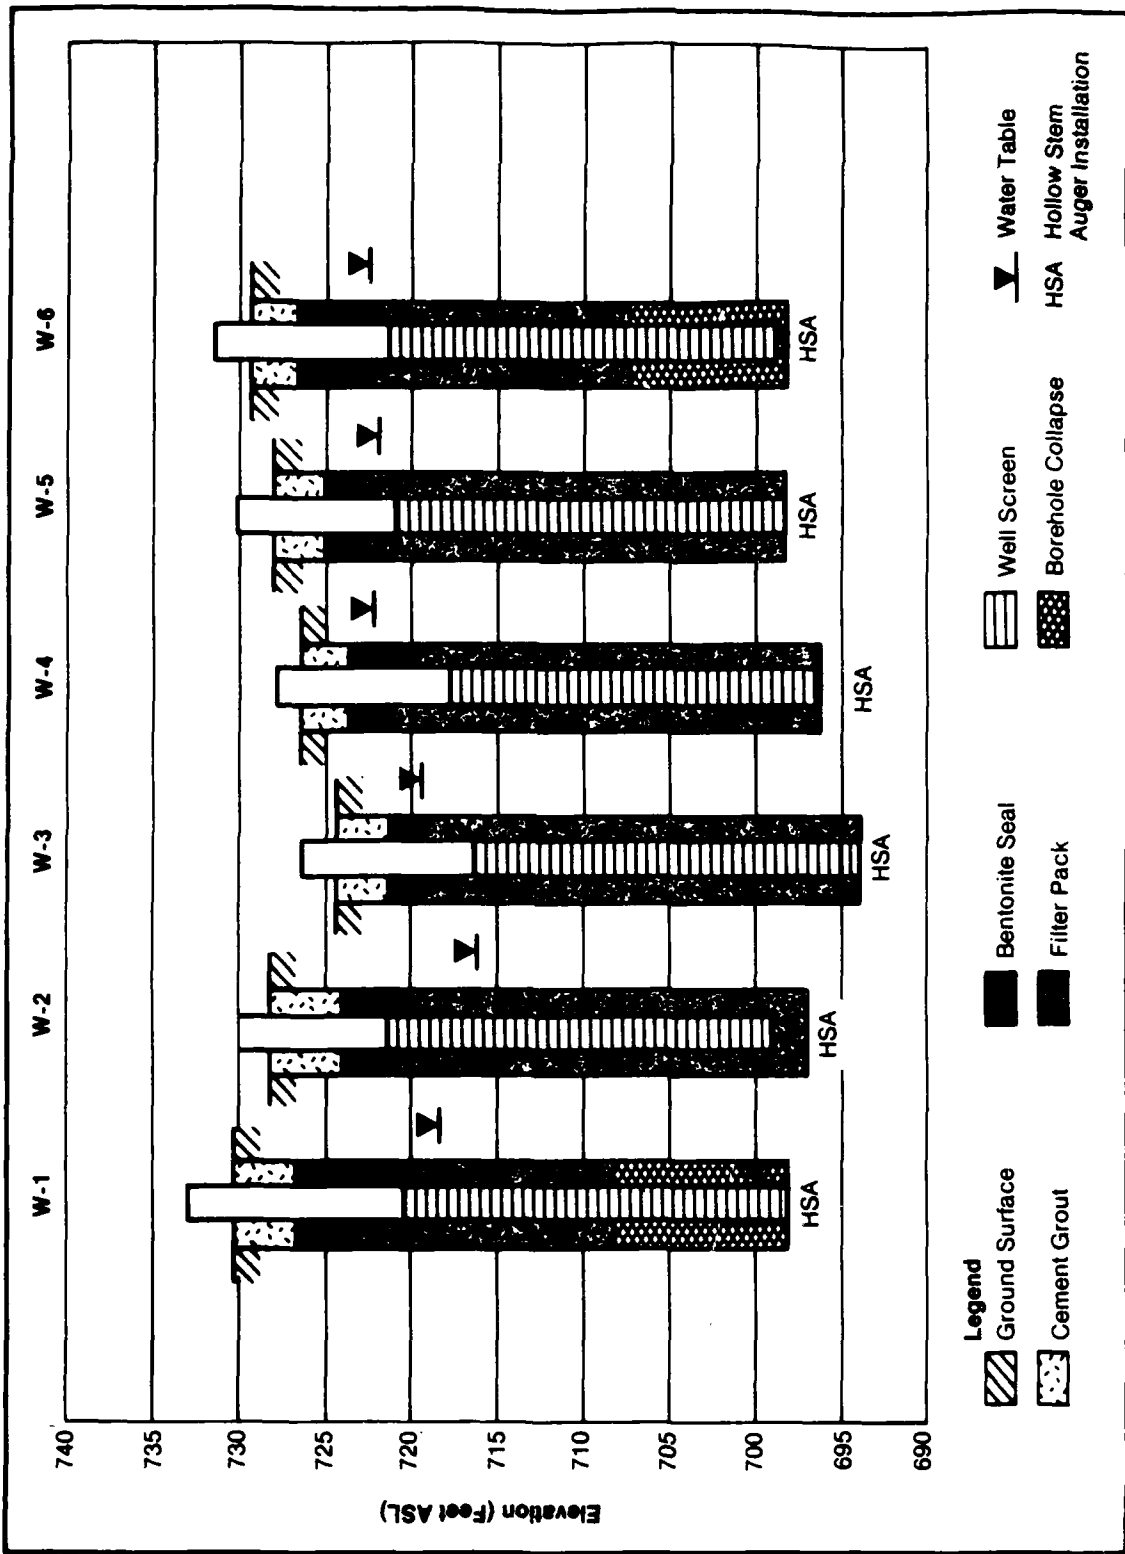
WELL CONSTRUCTION SUMMARY, FIRE PROTECTION TRAINING AREA 2
